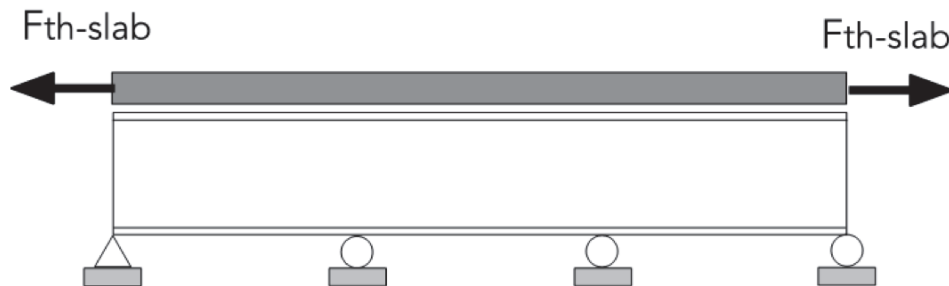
Bridge Deck Contraction Prevented by Girder-Slab Connection
